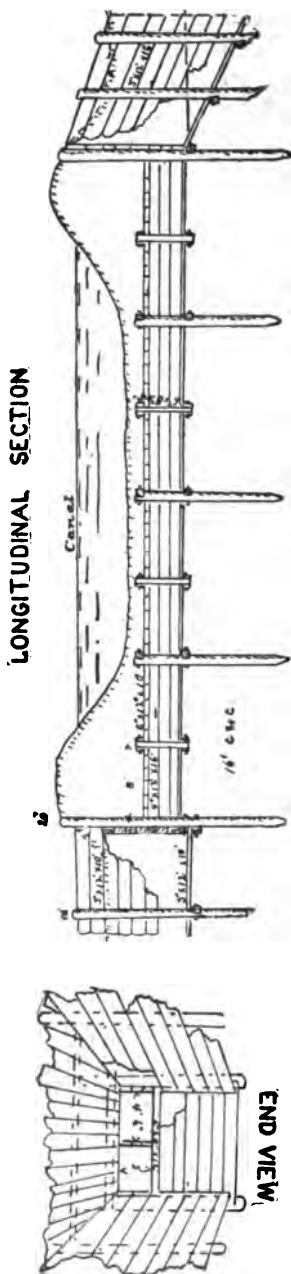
Sections of Wooden Culvert, Del Norte Canal, Colorado.
